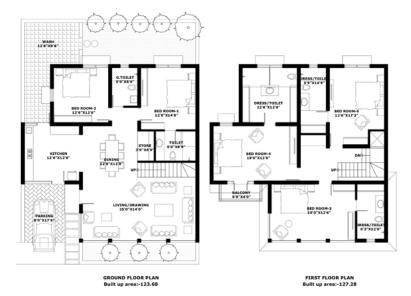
Ground and first floor plan of Chitrak Shah house
